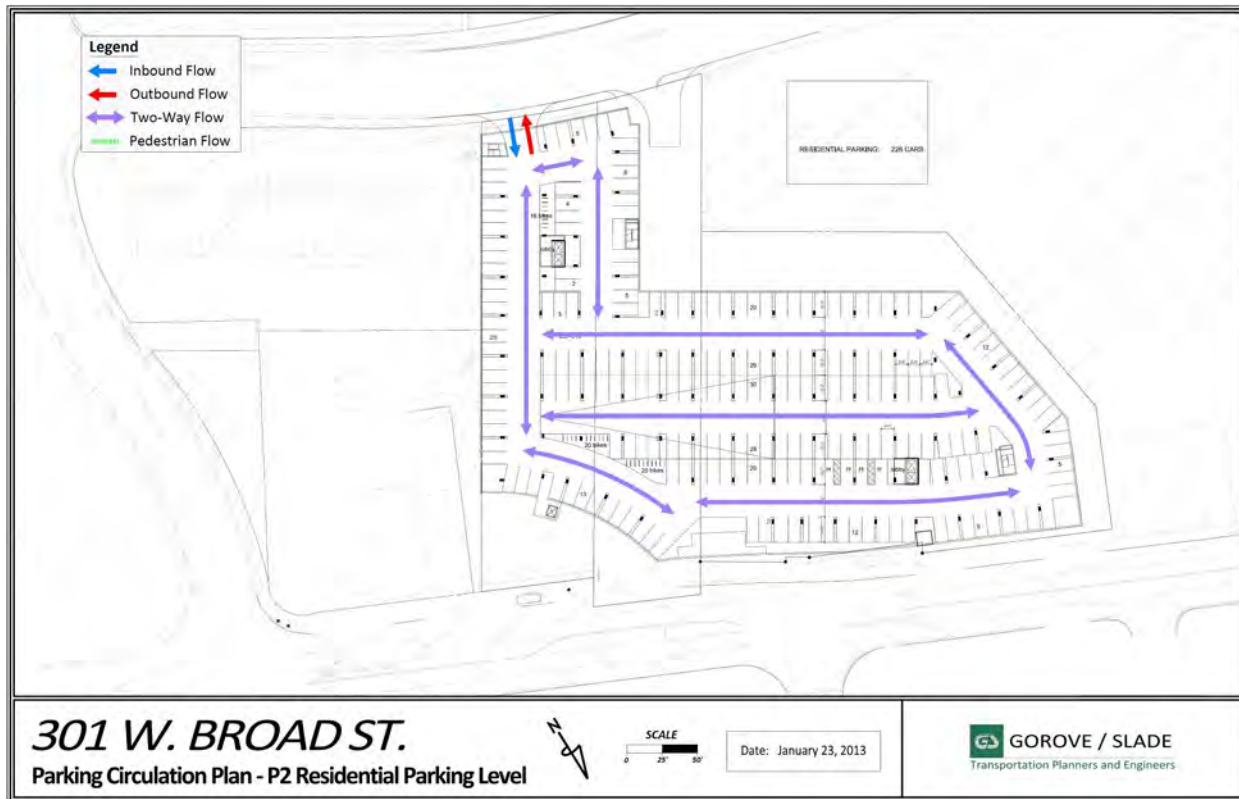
Parking Circulation Plan – P2 Residential Parking Level
